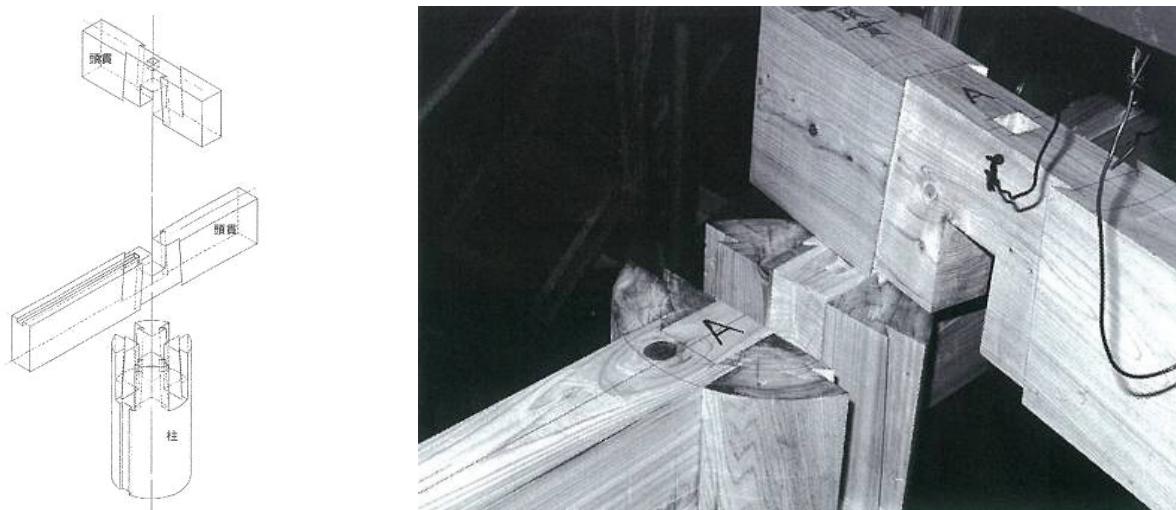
Example of “nuki” (= a kind of joint of column and beam)
